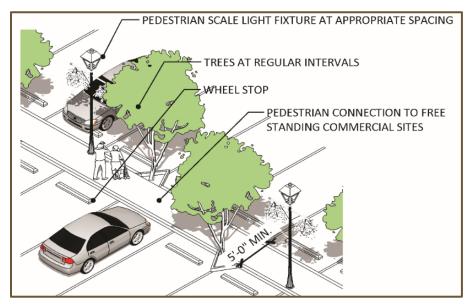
Typical Pedestrian Path Connecting Parking with Commercial Uses
